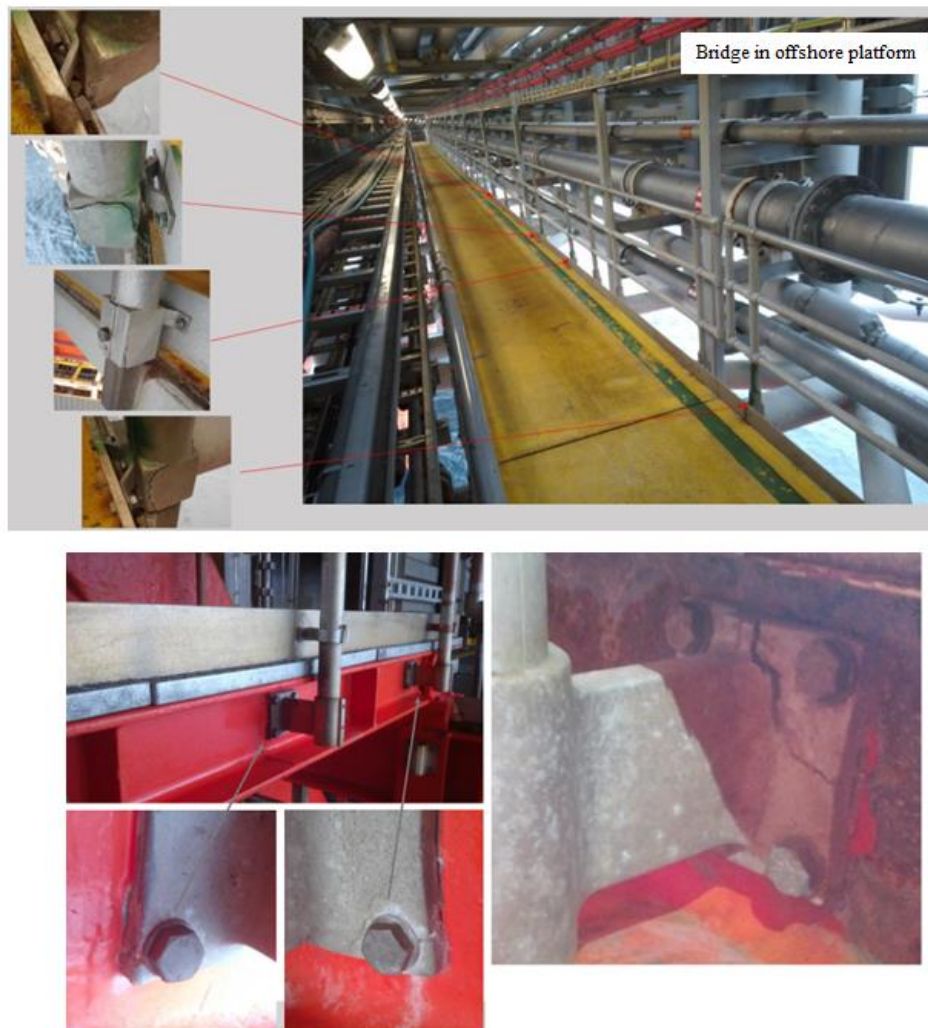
Fracture of cast aluminium component of handrails connected to stainless steel without insulation.
